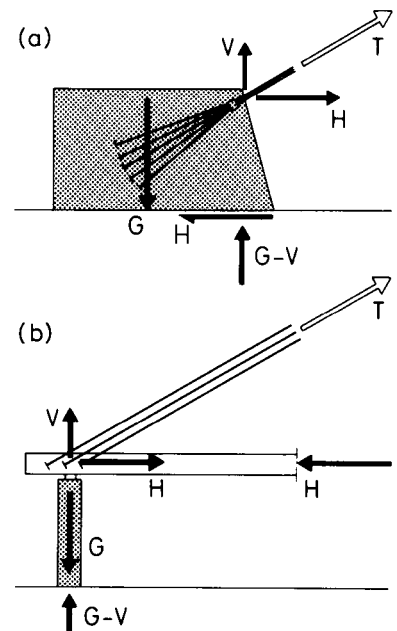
Connection between side span cable and anchor pier in an earth anchored system and in a self-anchored system
